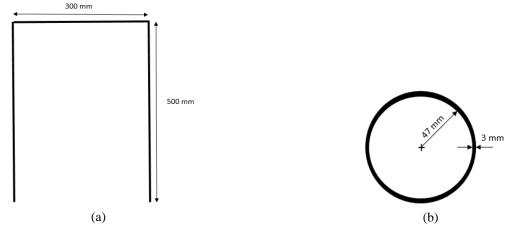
Sample case model for frame structures; a) Geometrical dimensions of the formed frame structure b) Cross-sectional dimensions of the elements used
